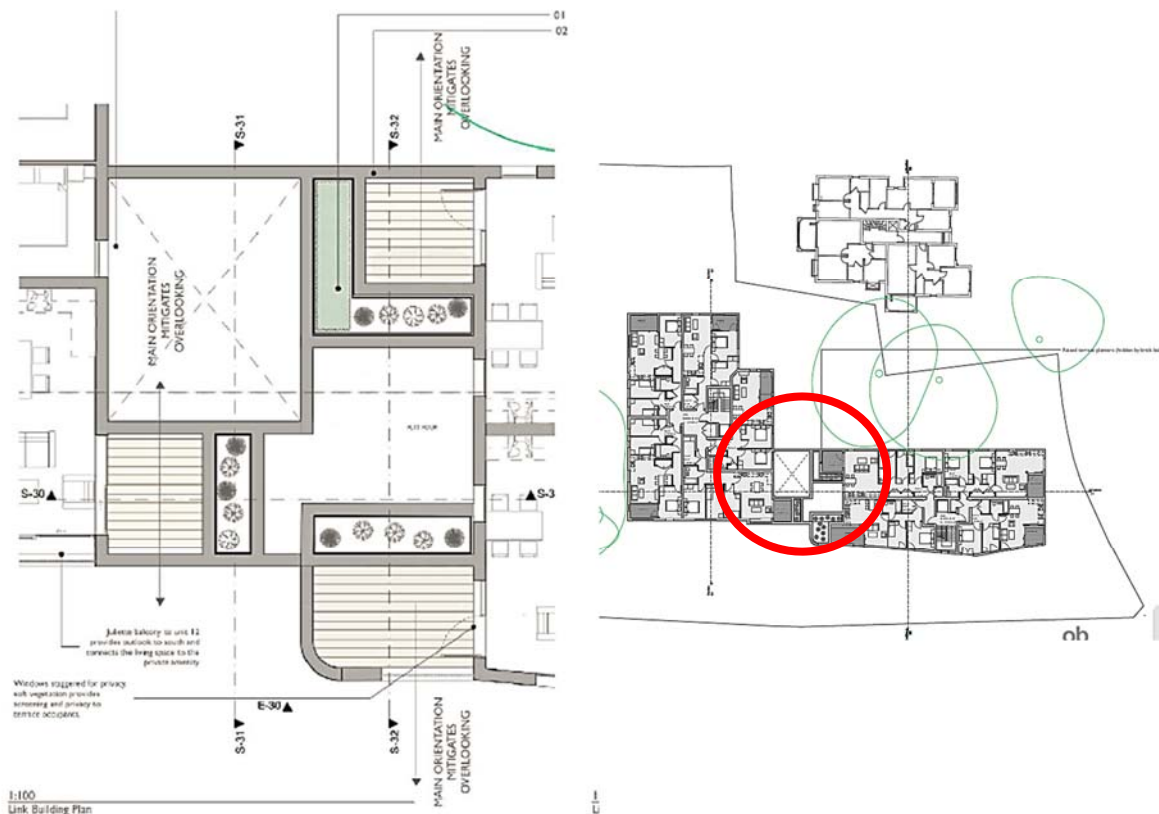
Relationship between units 12, 14 and 17 (left) and proposed first floor plan (right)
